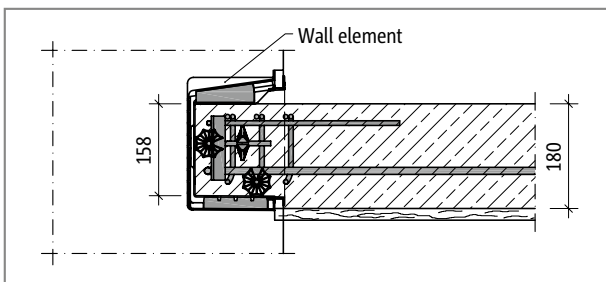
Schöck Tronsole® type Z: Wall element as stay-in-place formwork; underside of the landing flush with the connection frame of the wall element
